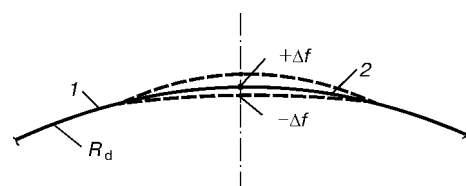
Possible positions of sheet inserts after welding-in: 1 – design position of tank wall; 2 – sheet insert
